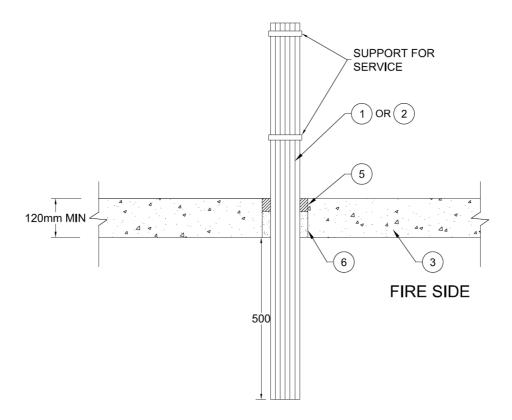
Typical details for cables and metal pipes penetrating floors with 3M CP 25WB+ Sealant
